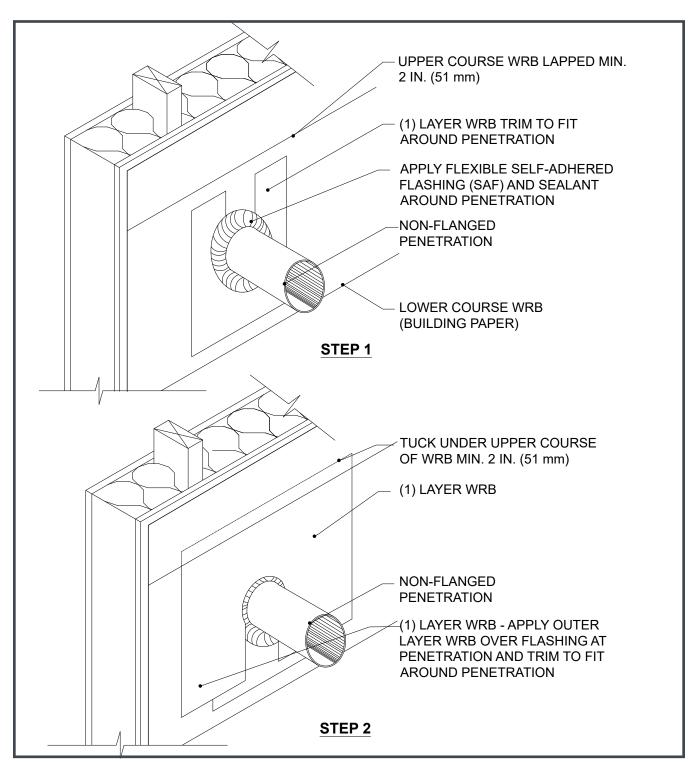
Penetration Non-Flanged, with Housewrap WRB
